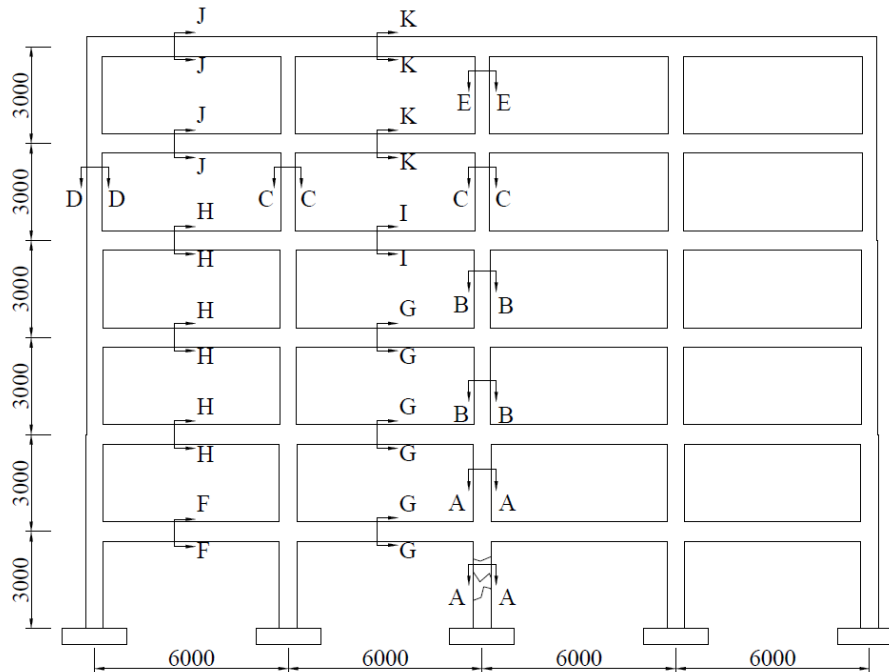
Design details of the RC test frame specimen (Unit: mm).
